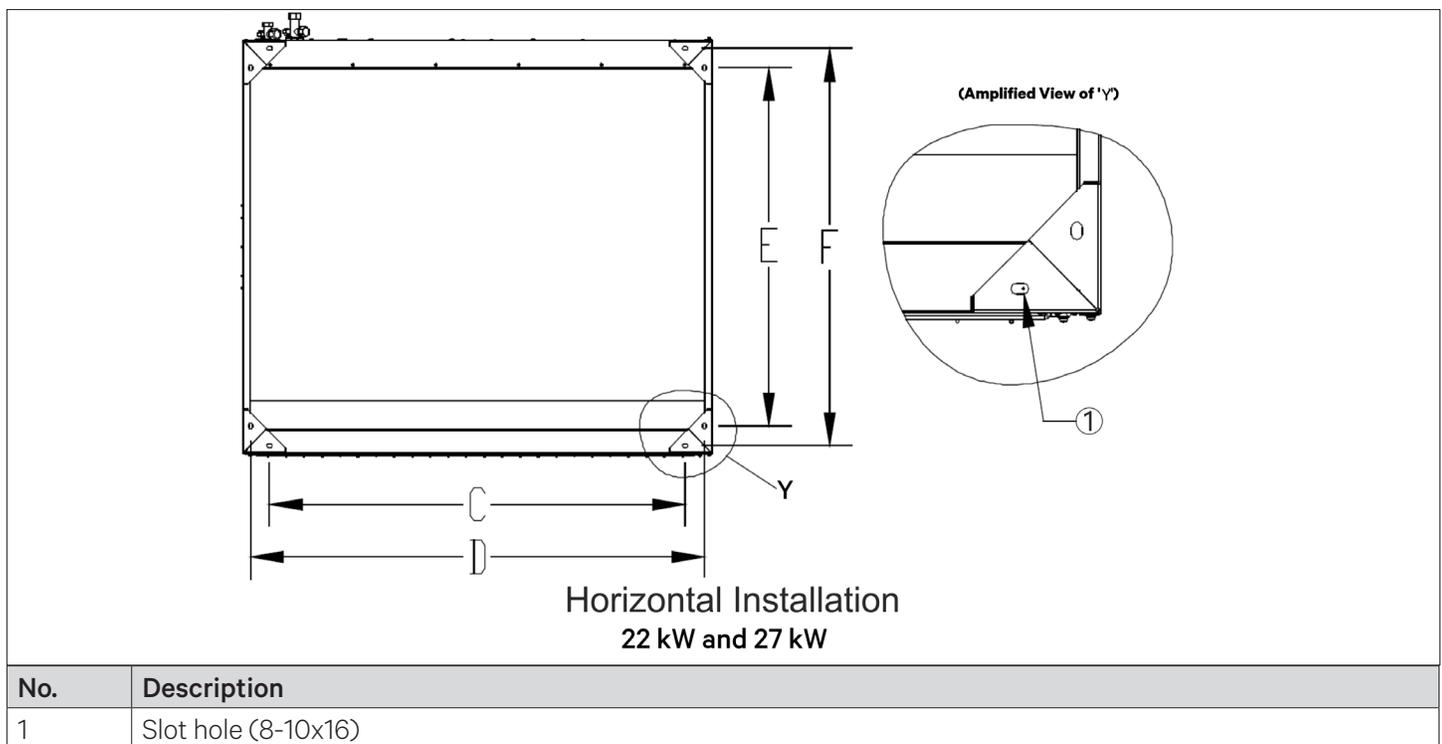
Hole Dimension of Outdoor Unit Base (Horizontal Installation)
